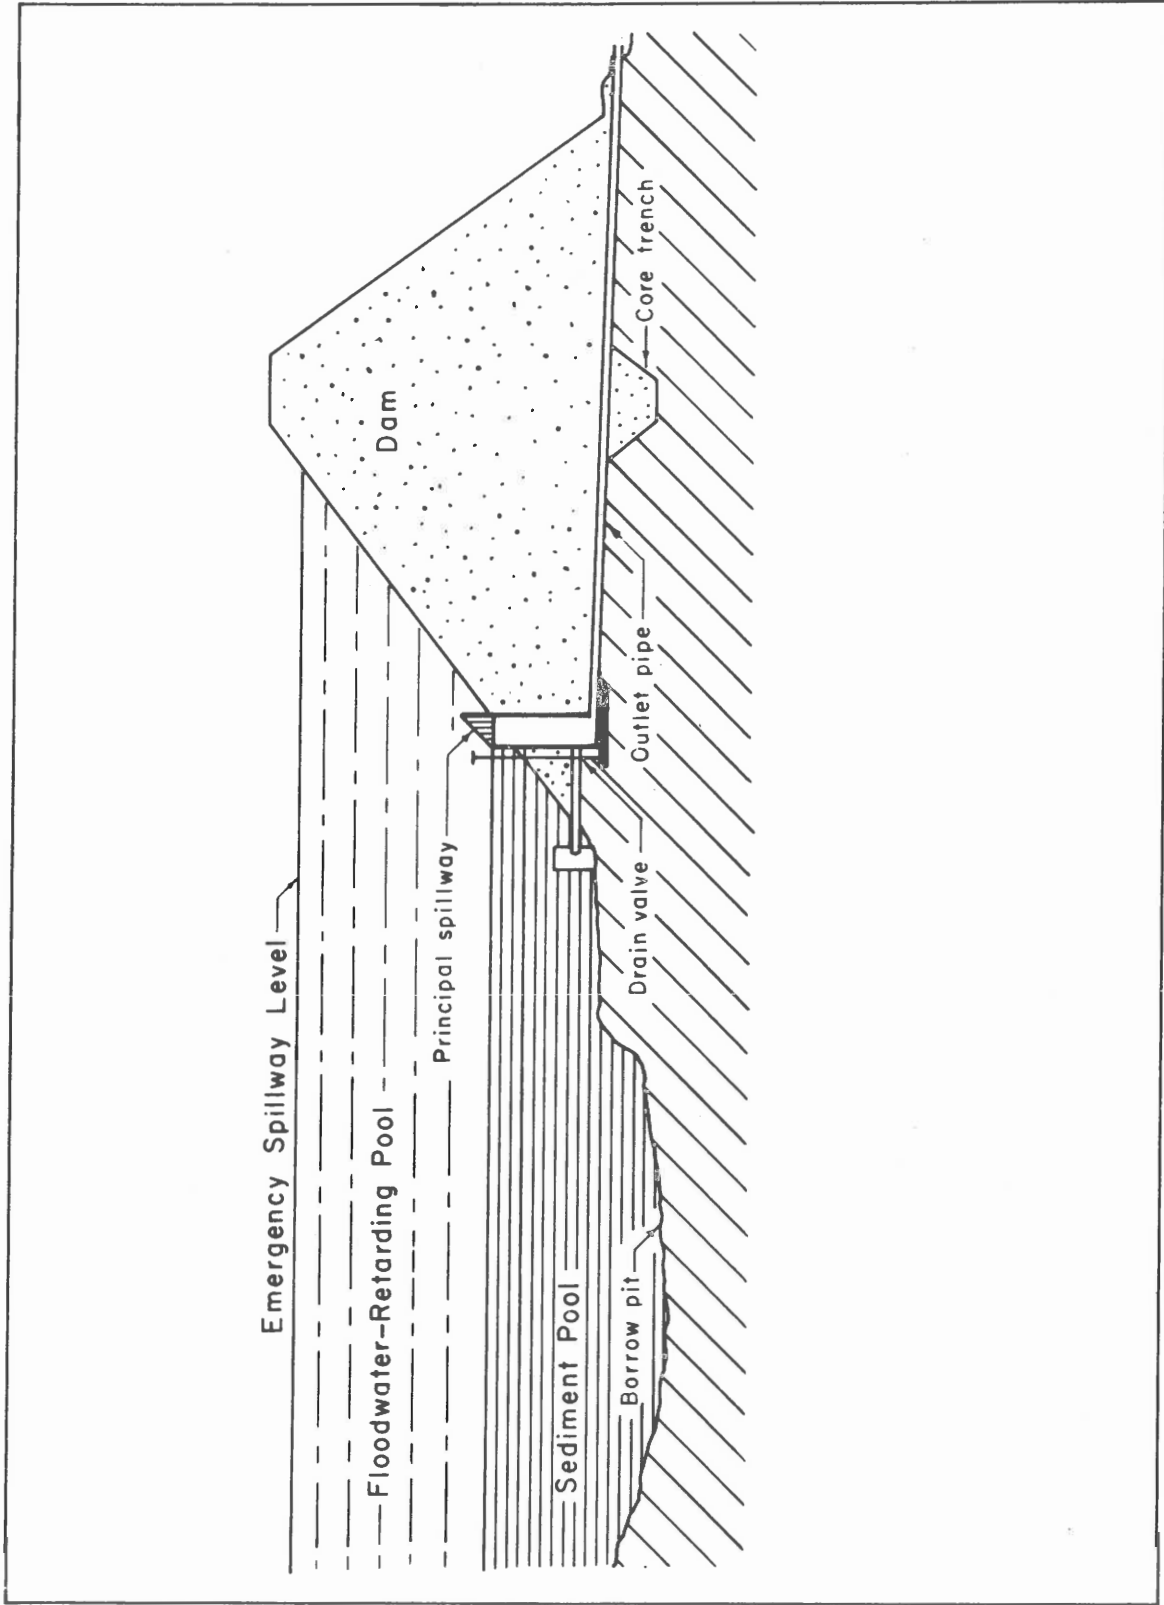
Section of typical floodwater-retarding structure with outlet works
